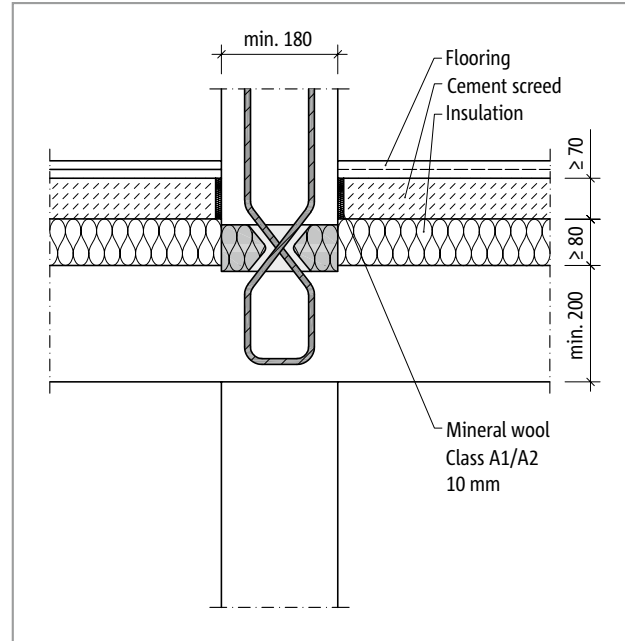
Schöck Sconnex® type W: R 120 / EI 60 with internal wall and above-slab insulation
